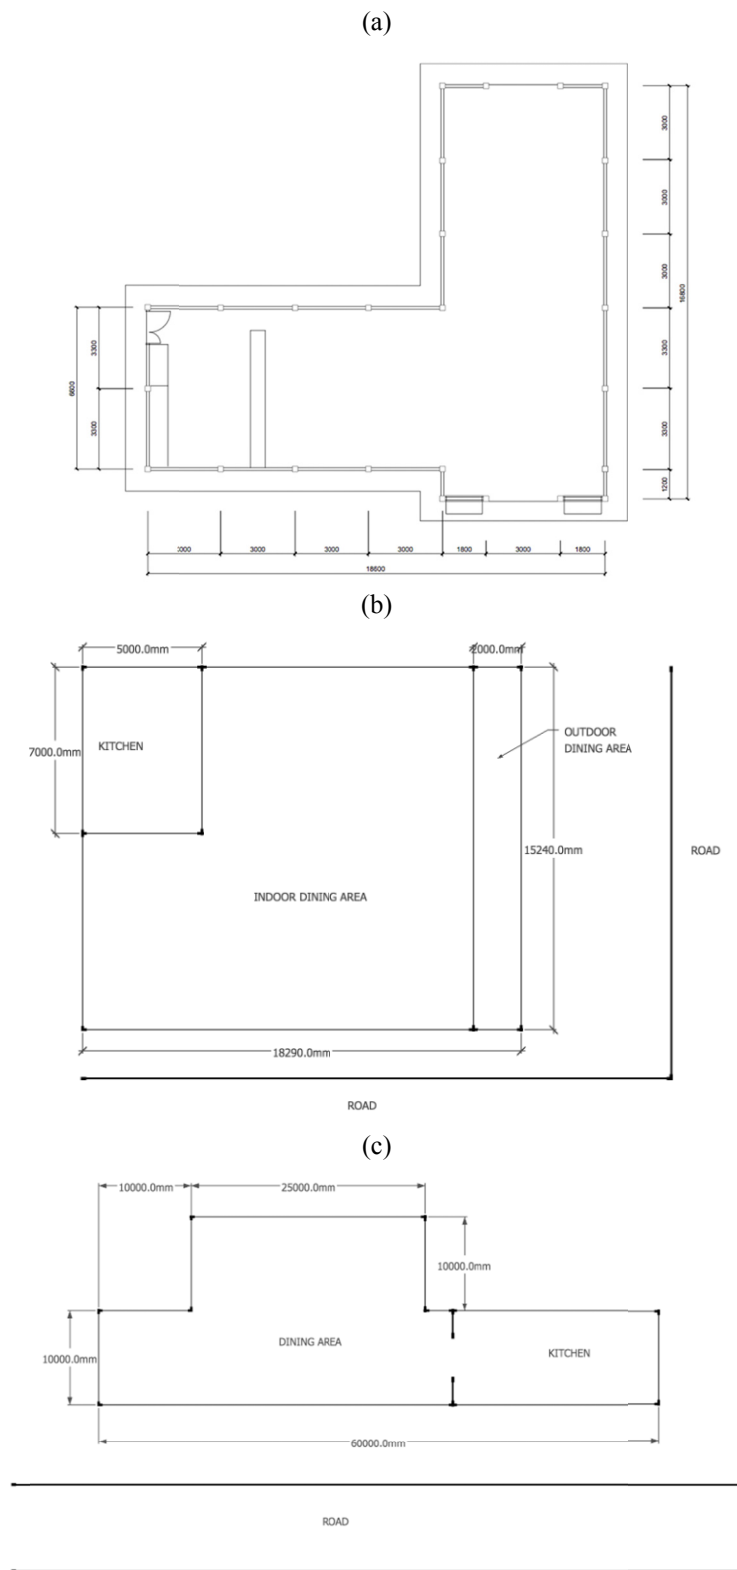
(a) Floor plan of restaurant RF (open-air Restaurant Far from a road) (b) floor plan of restaurant RBR (open-air Restaurant Beside a Road) (c) floor plan of restaurant RNR (open-air Restaurant Near a Road) and the location of roads for (b) and (c); dimensions are in mm
